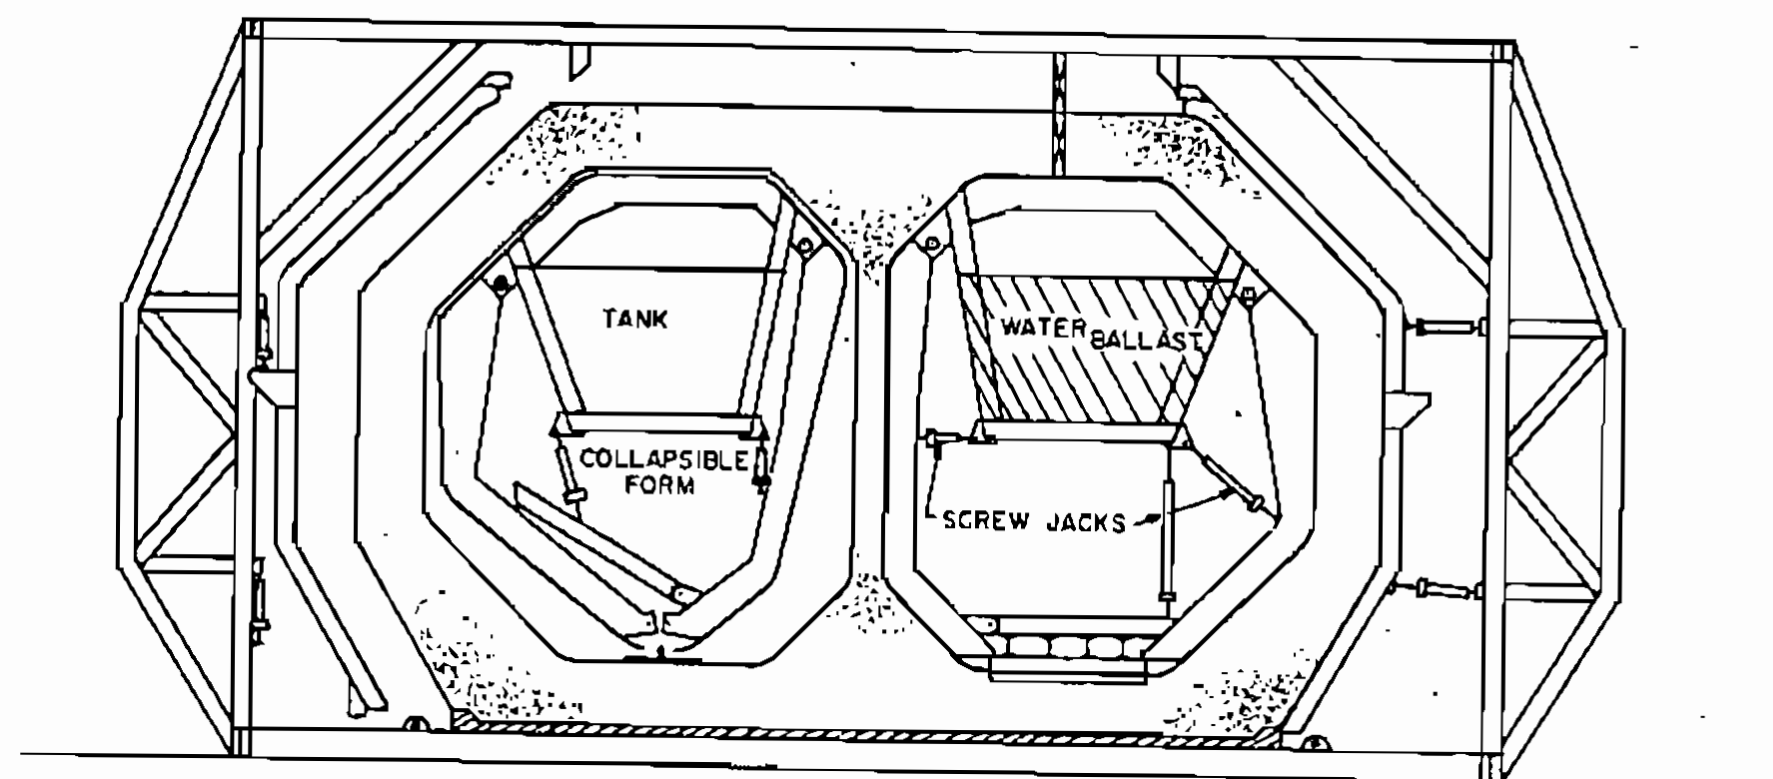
Casting forms used in Metro Rotterdam tunnel
